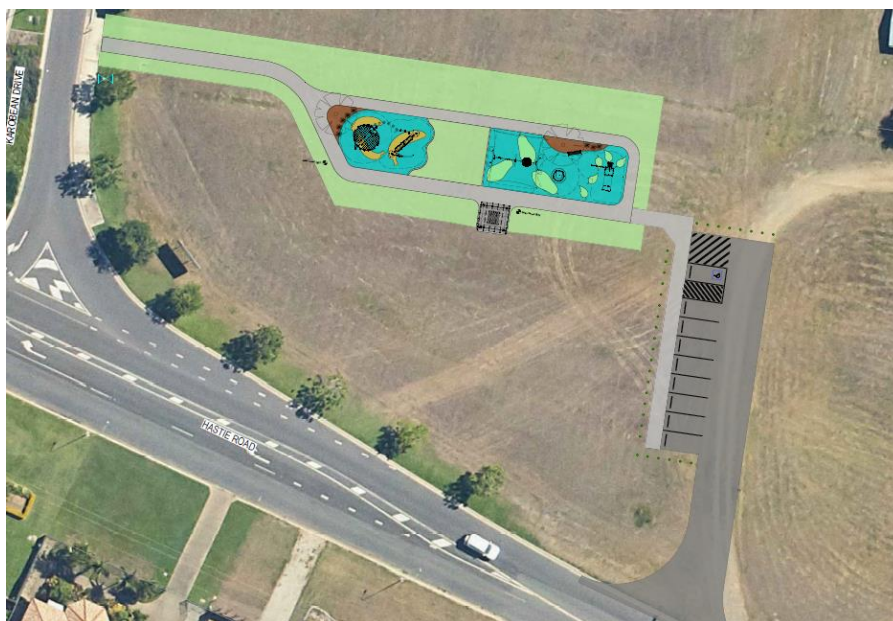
Mareeba East Catchment Park Playground and Carpark Layout
